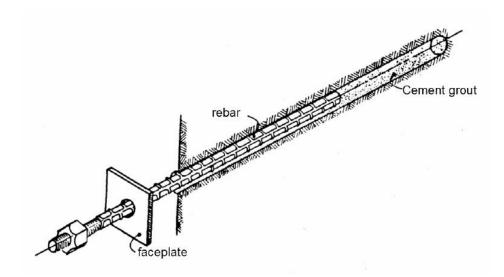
Grouted dowel using a deformed bar inserted into a grout-filled hole
